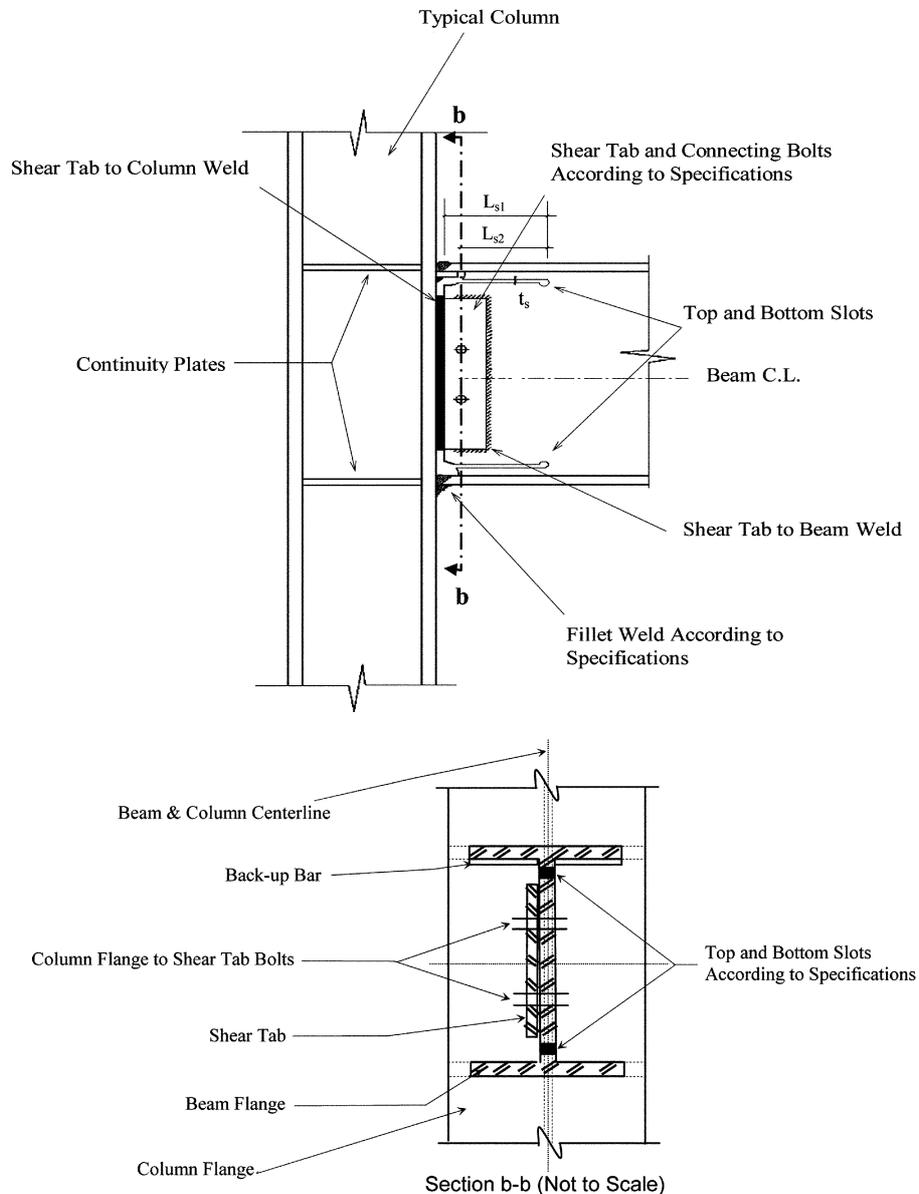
A BWWF-AD (SlottedWeb™) connection detail (Not to Scale)
